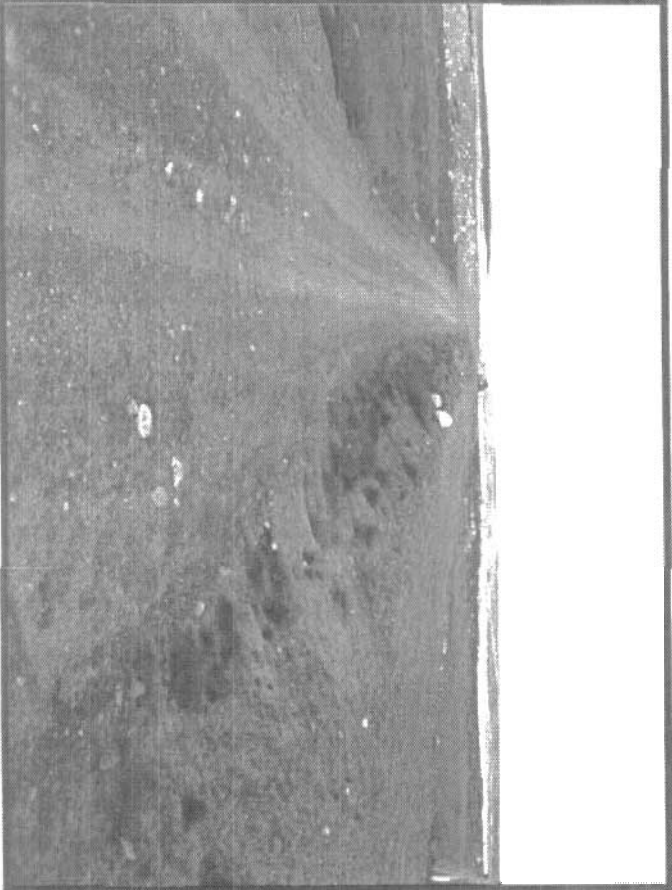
shows the downstream side and the crest of the dam looking towards north. Some minor vegetation is catching onto the slope.
